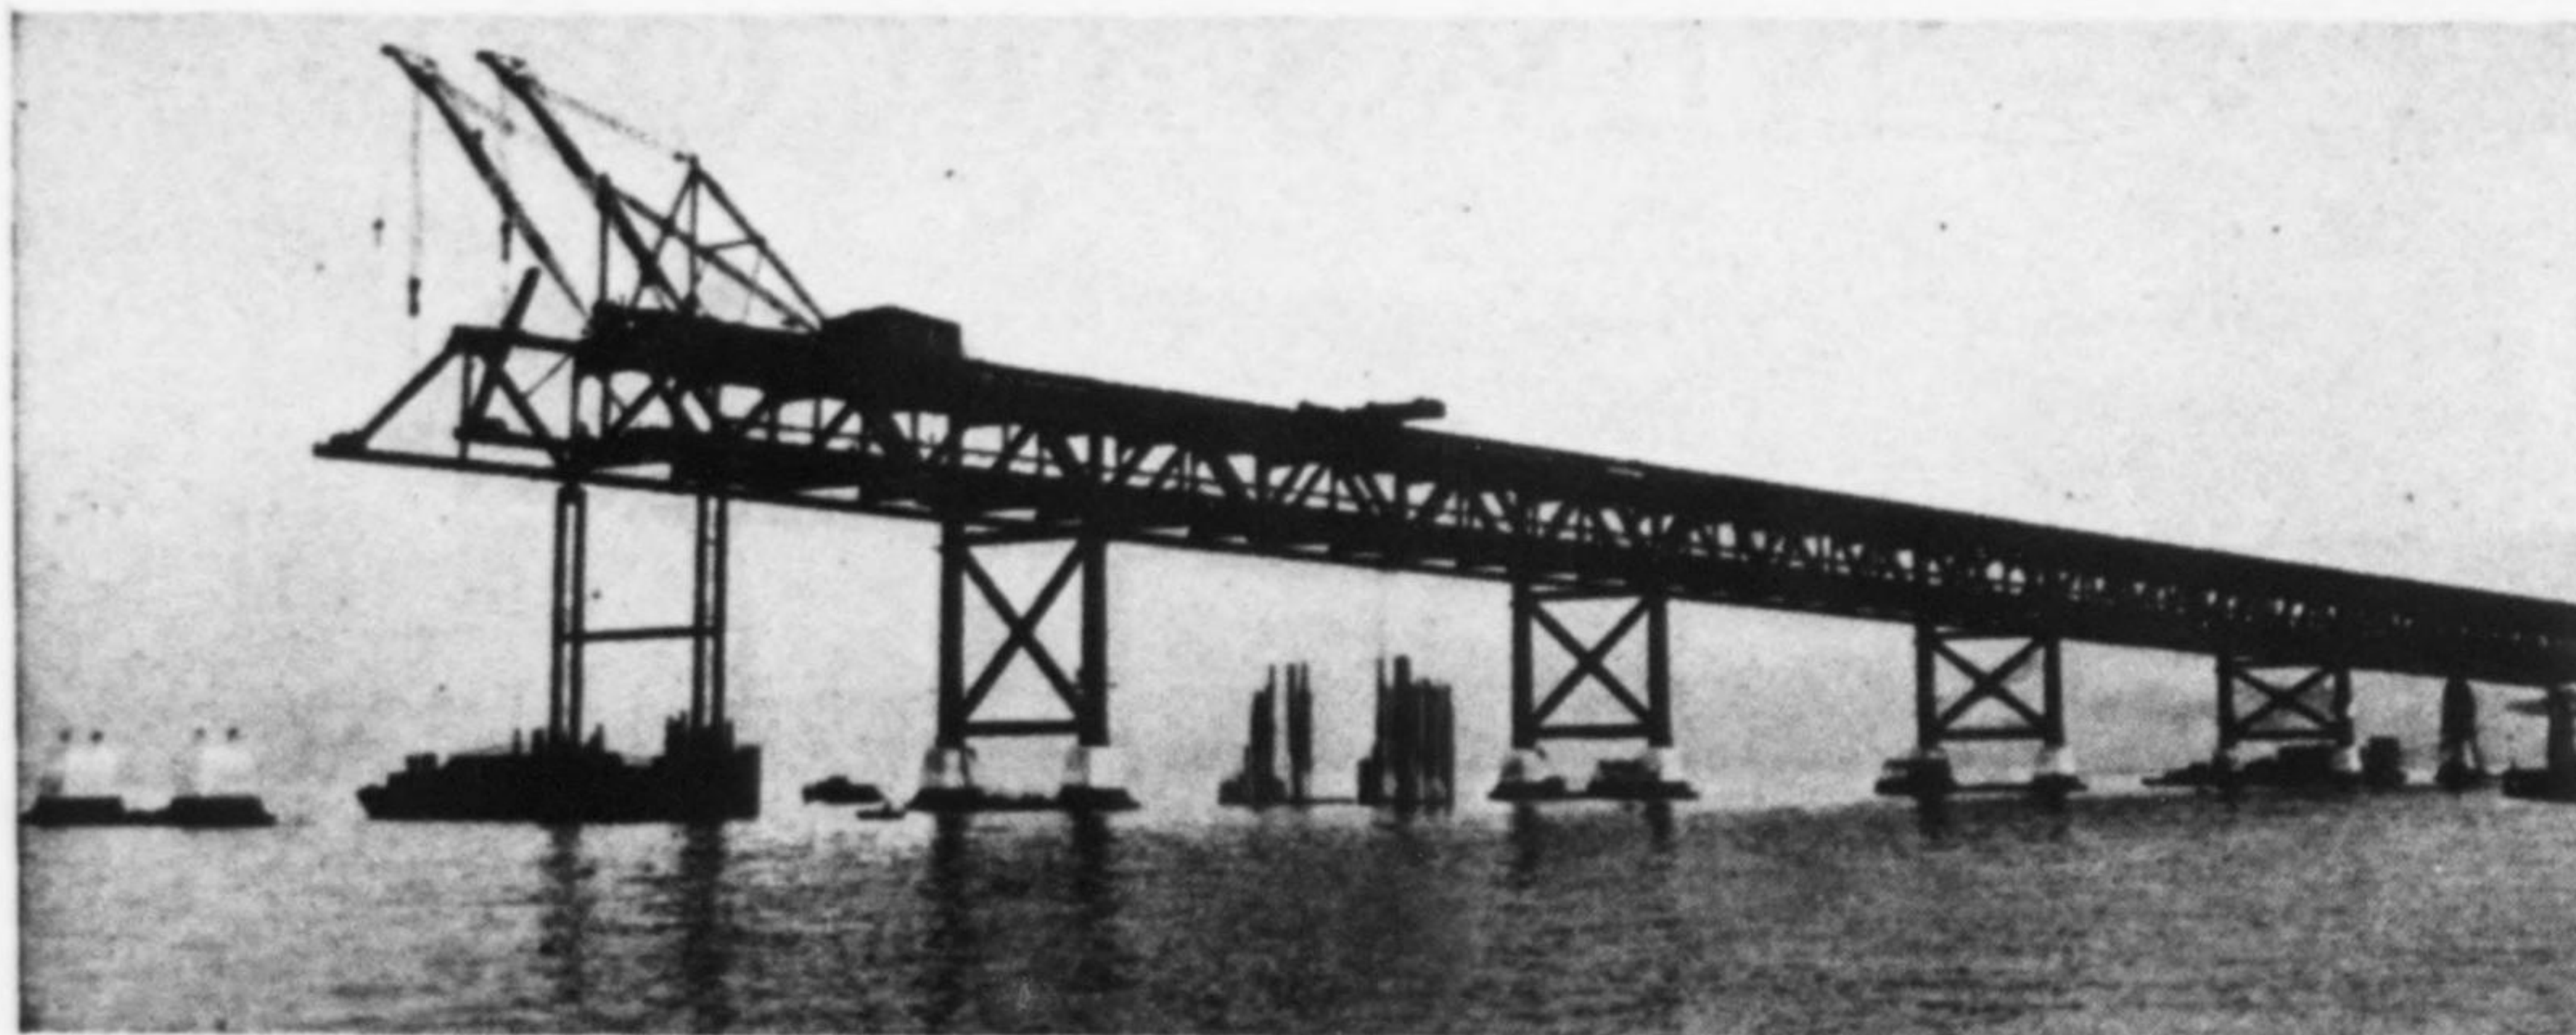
TRAVELER erecting 288-FT. SPAN. Temporary bent on steel piles in foreground. Pile puller in span behind traveler is removing falsework piles.
